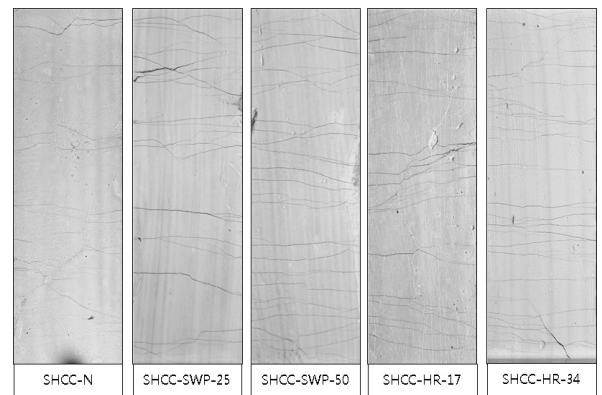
Typical crack patterns of dumbbell-shaped specimens
